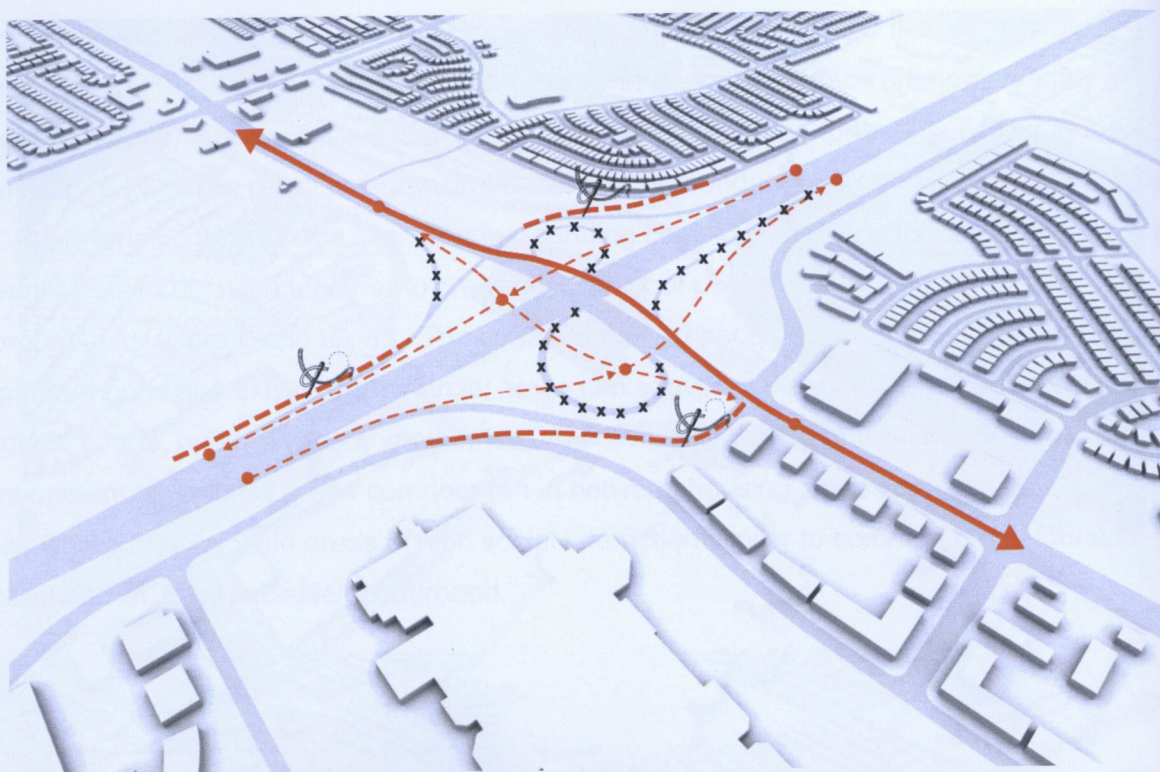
Diagram illustrating the proposed removal of the current interchange configuration. On- and Off- ramps are sunken underground. Dots represent new tunnel entrances. The overpass is maintained and transformed into a boulevard.
